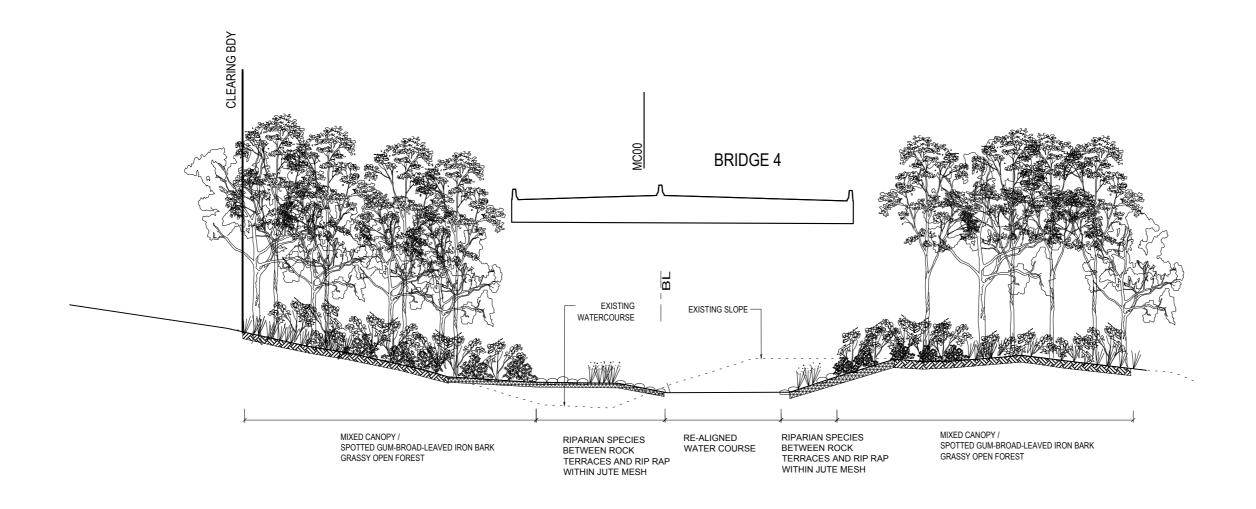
(a) Detail Plan- showing the re-aligned watercourse 2, under Bridge 4
